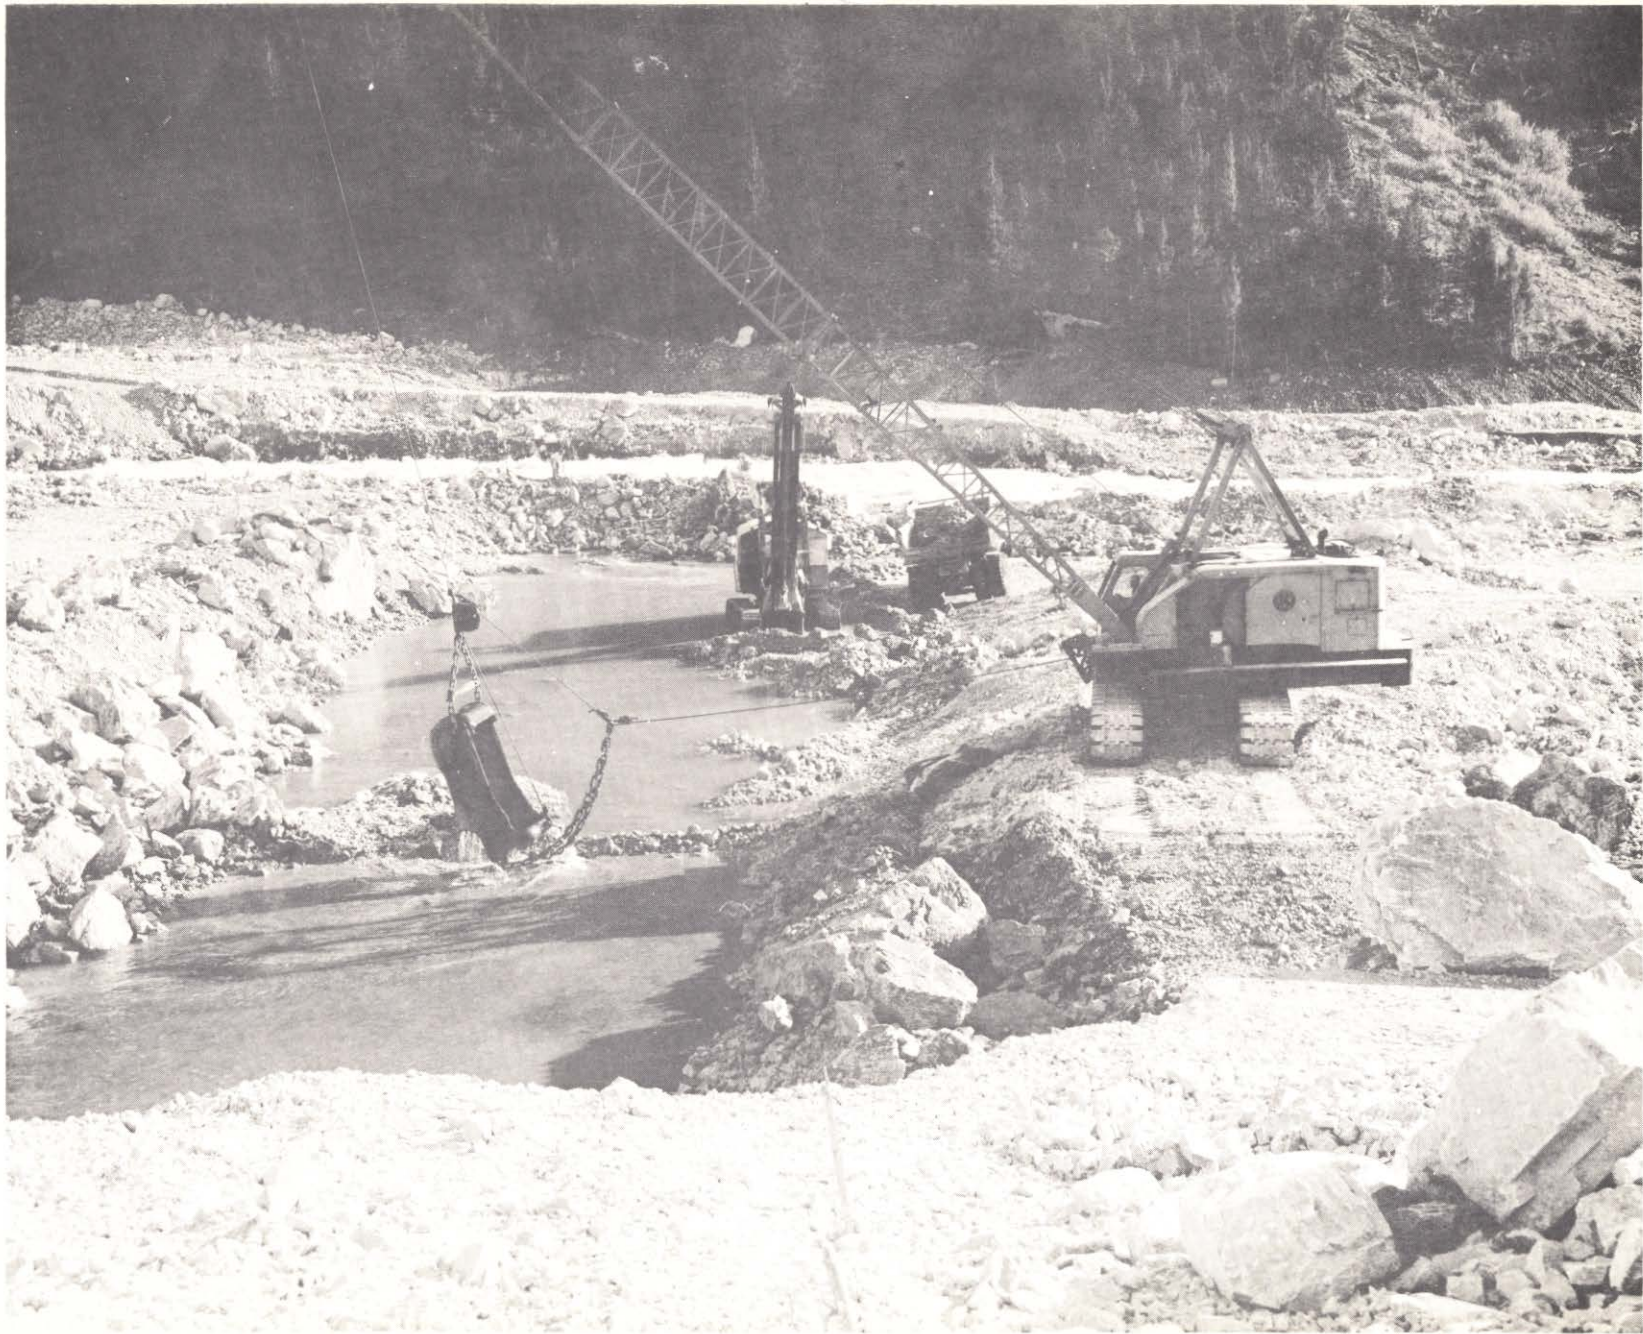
16 September 1959. Foundation excavation for first rock filled drop structure at about Station 6+00.
